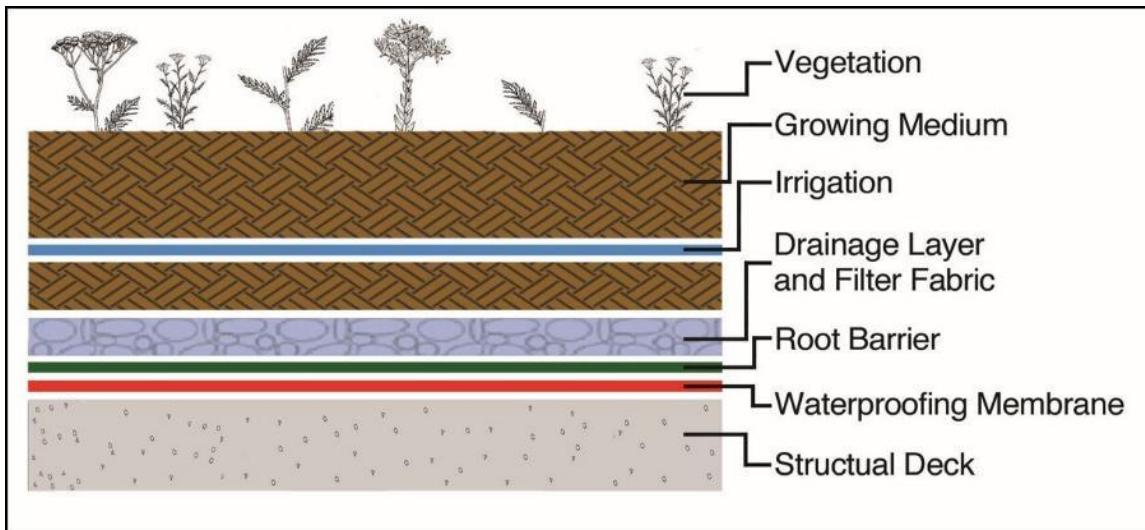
Typical green roof cross-section (with optional irrigation) (guideline 4b).
